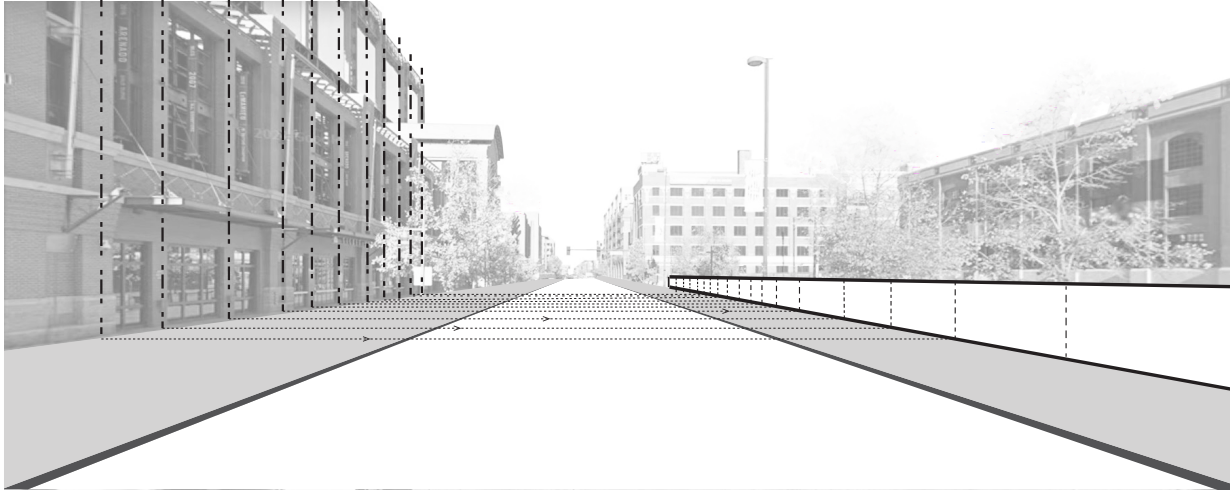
Spacing of Fence Masonry Columns. Illustrative only.
